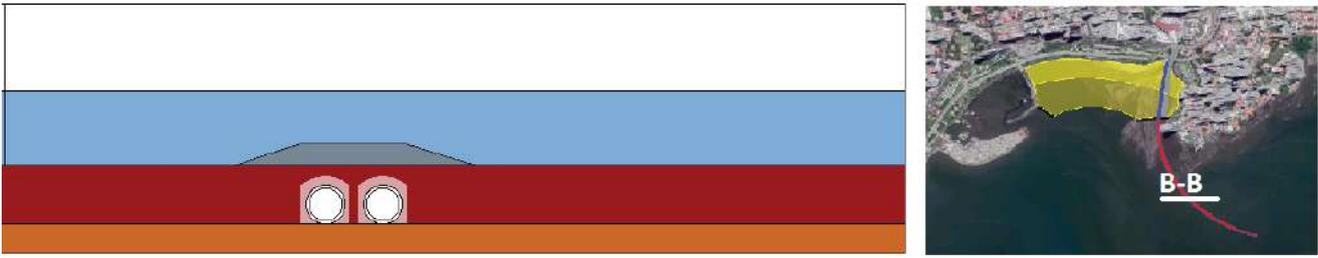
Phase 9: Placing remaining outfall section and backfilling
